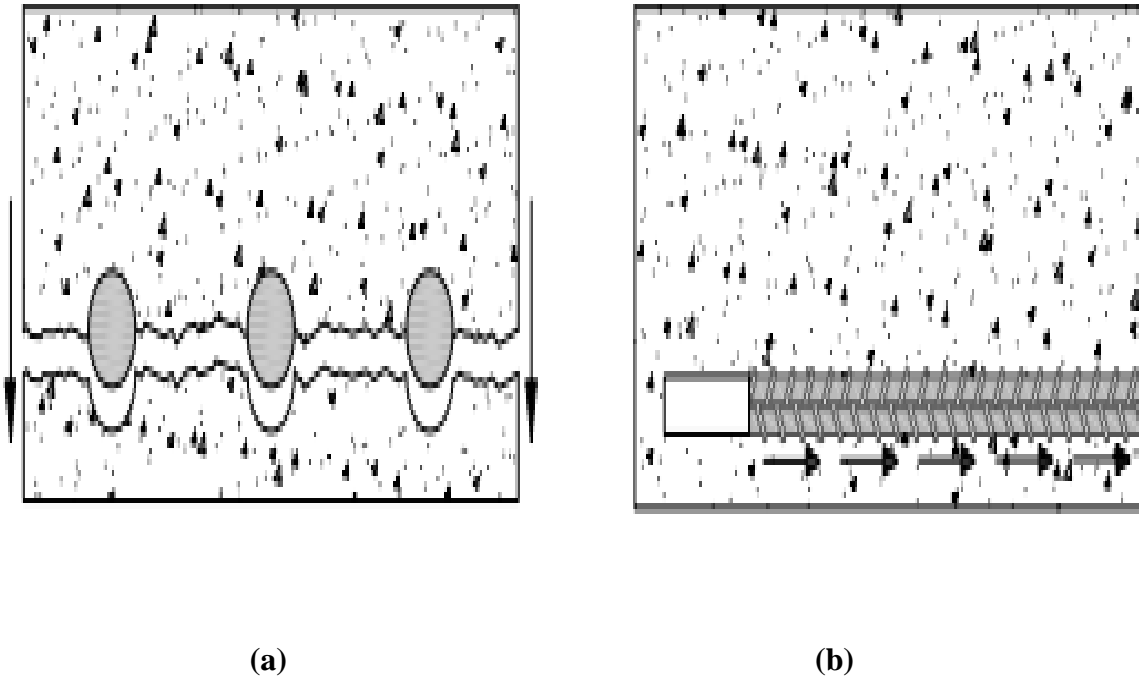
2 Failure modes: splitting and pull-out (Marchetto 2015)
